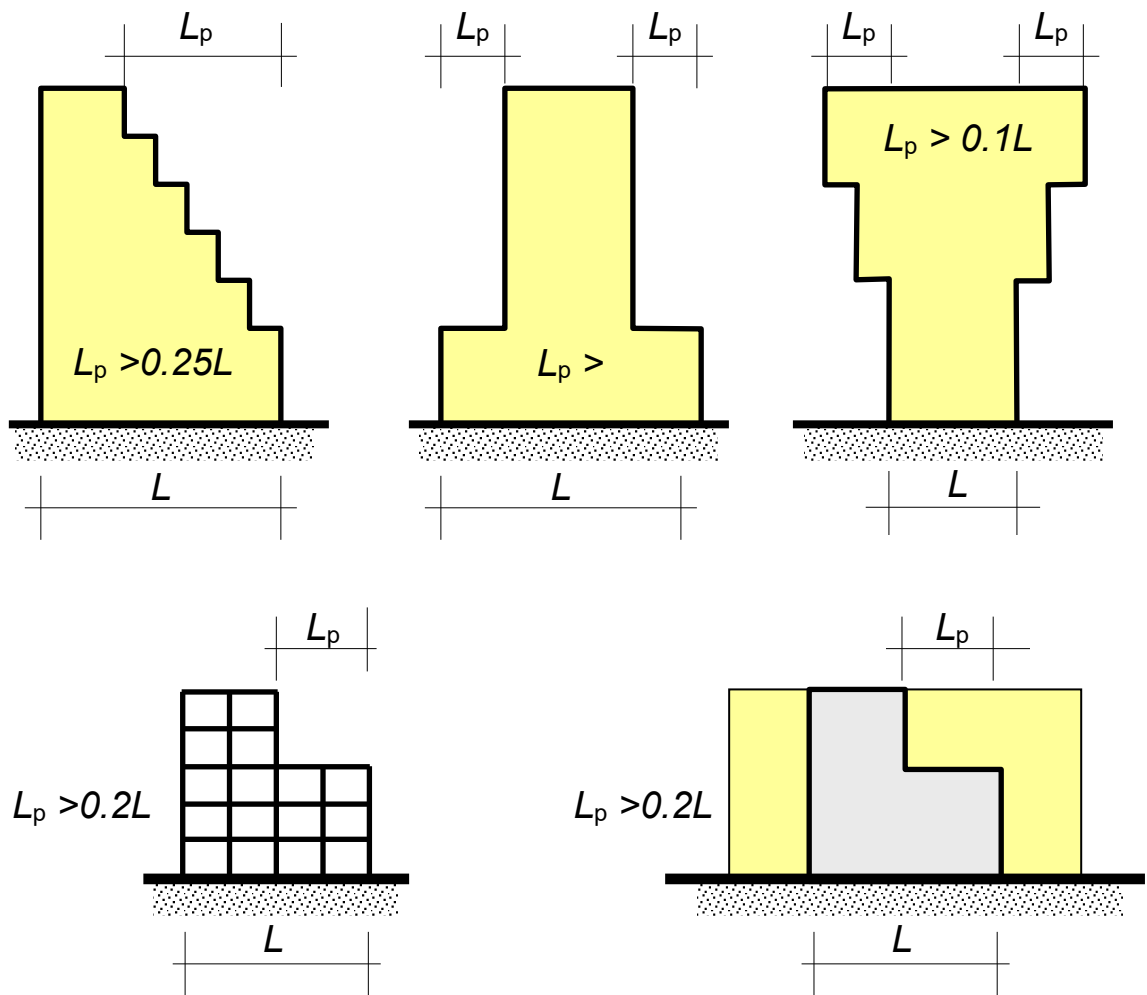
RE-ENTRANT CORNERS IN BUILDINGS
